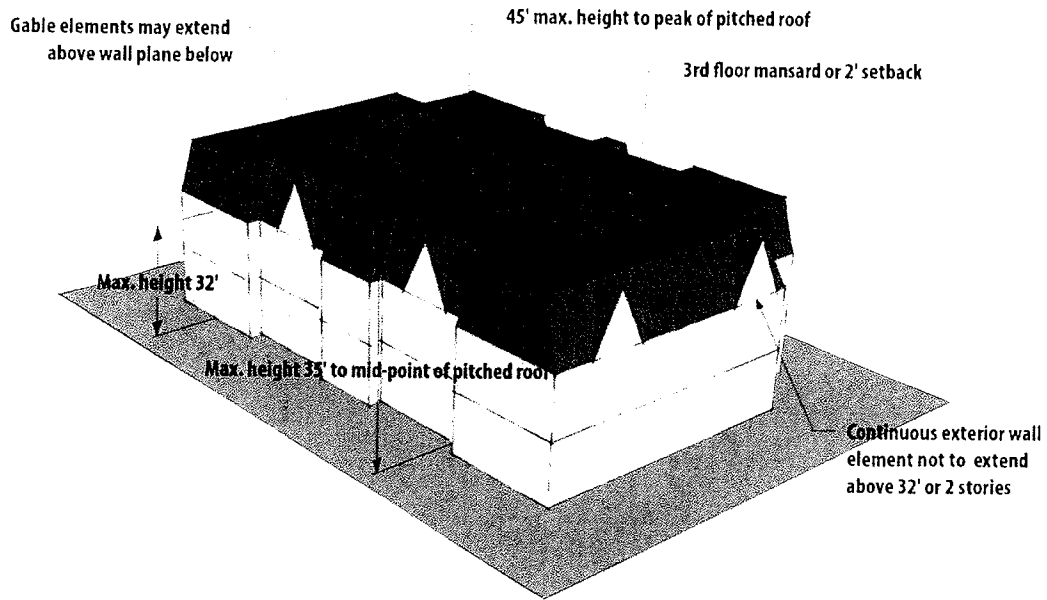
Senior Living Campus Building Heights Facing Villa Drive
